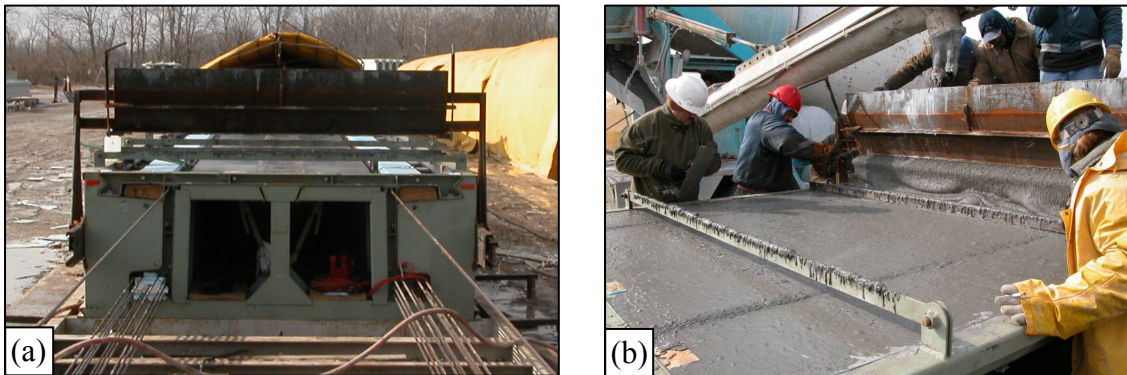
(a) Girder Formwork and (b) Placing the Deck.
